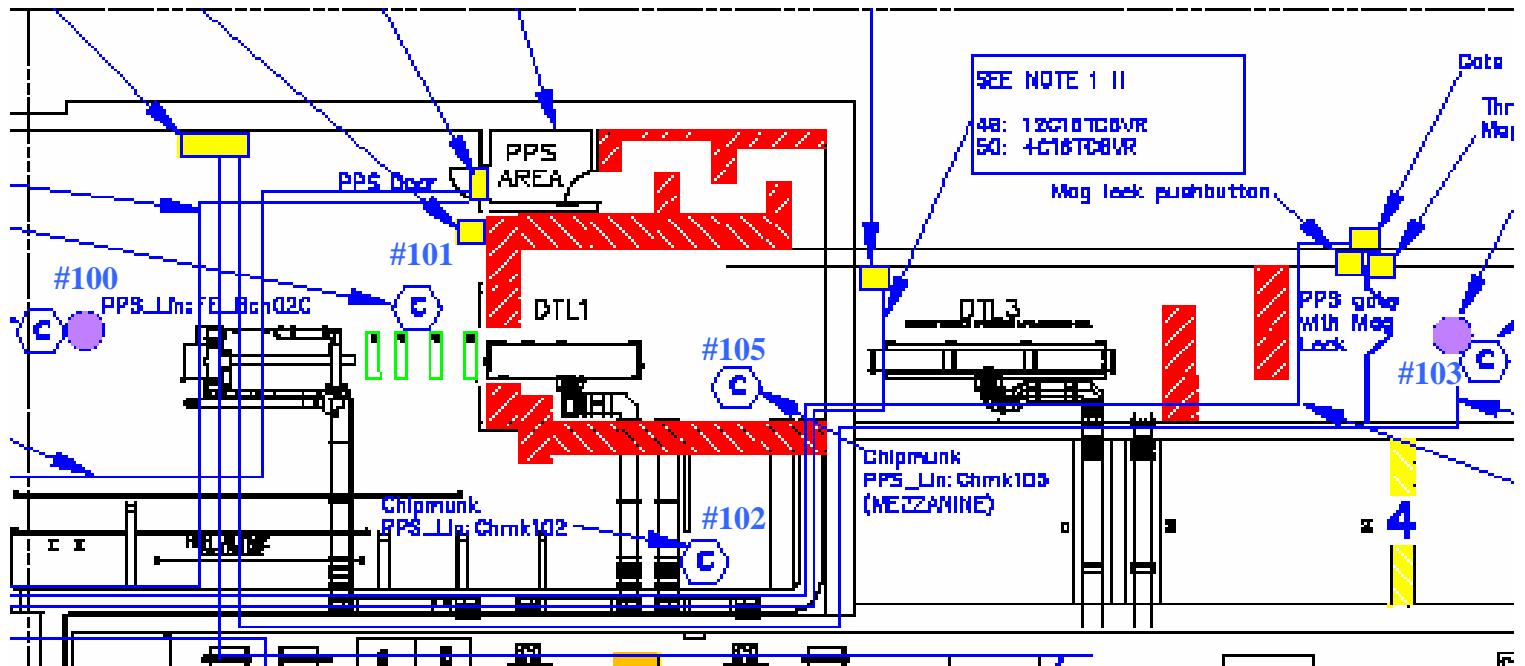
Personnel Protection System (PPS) layout of the FE-DTL1-3 beam line;
